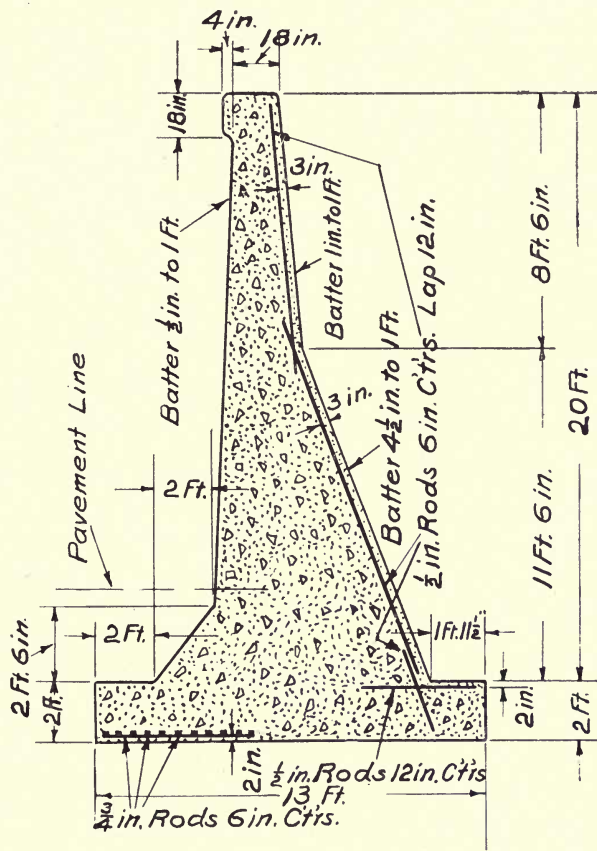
CROSS SECTION TYPICAL RETAINING WALL, C., B. & Q. R. R.
